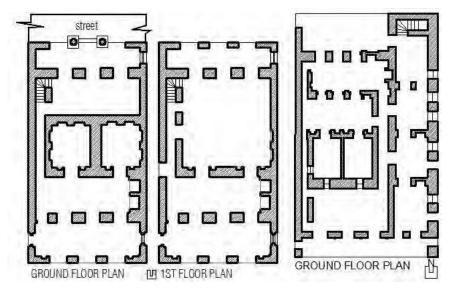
Consolidated type: a) Plan of Building no-2 (Double Story) and b) Plan of Building no-37 (Single Story) (Source: Dept. of Archaeology)
